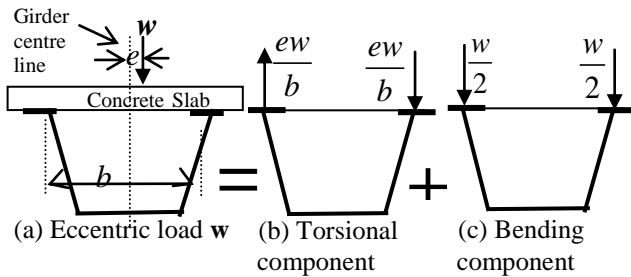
Decomposition of eccentric concrete load on trapezoidal box girder
